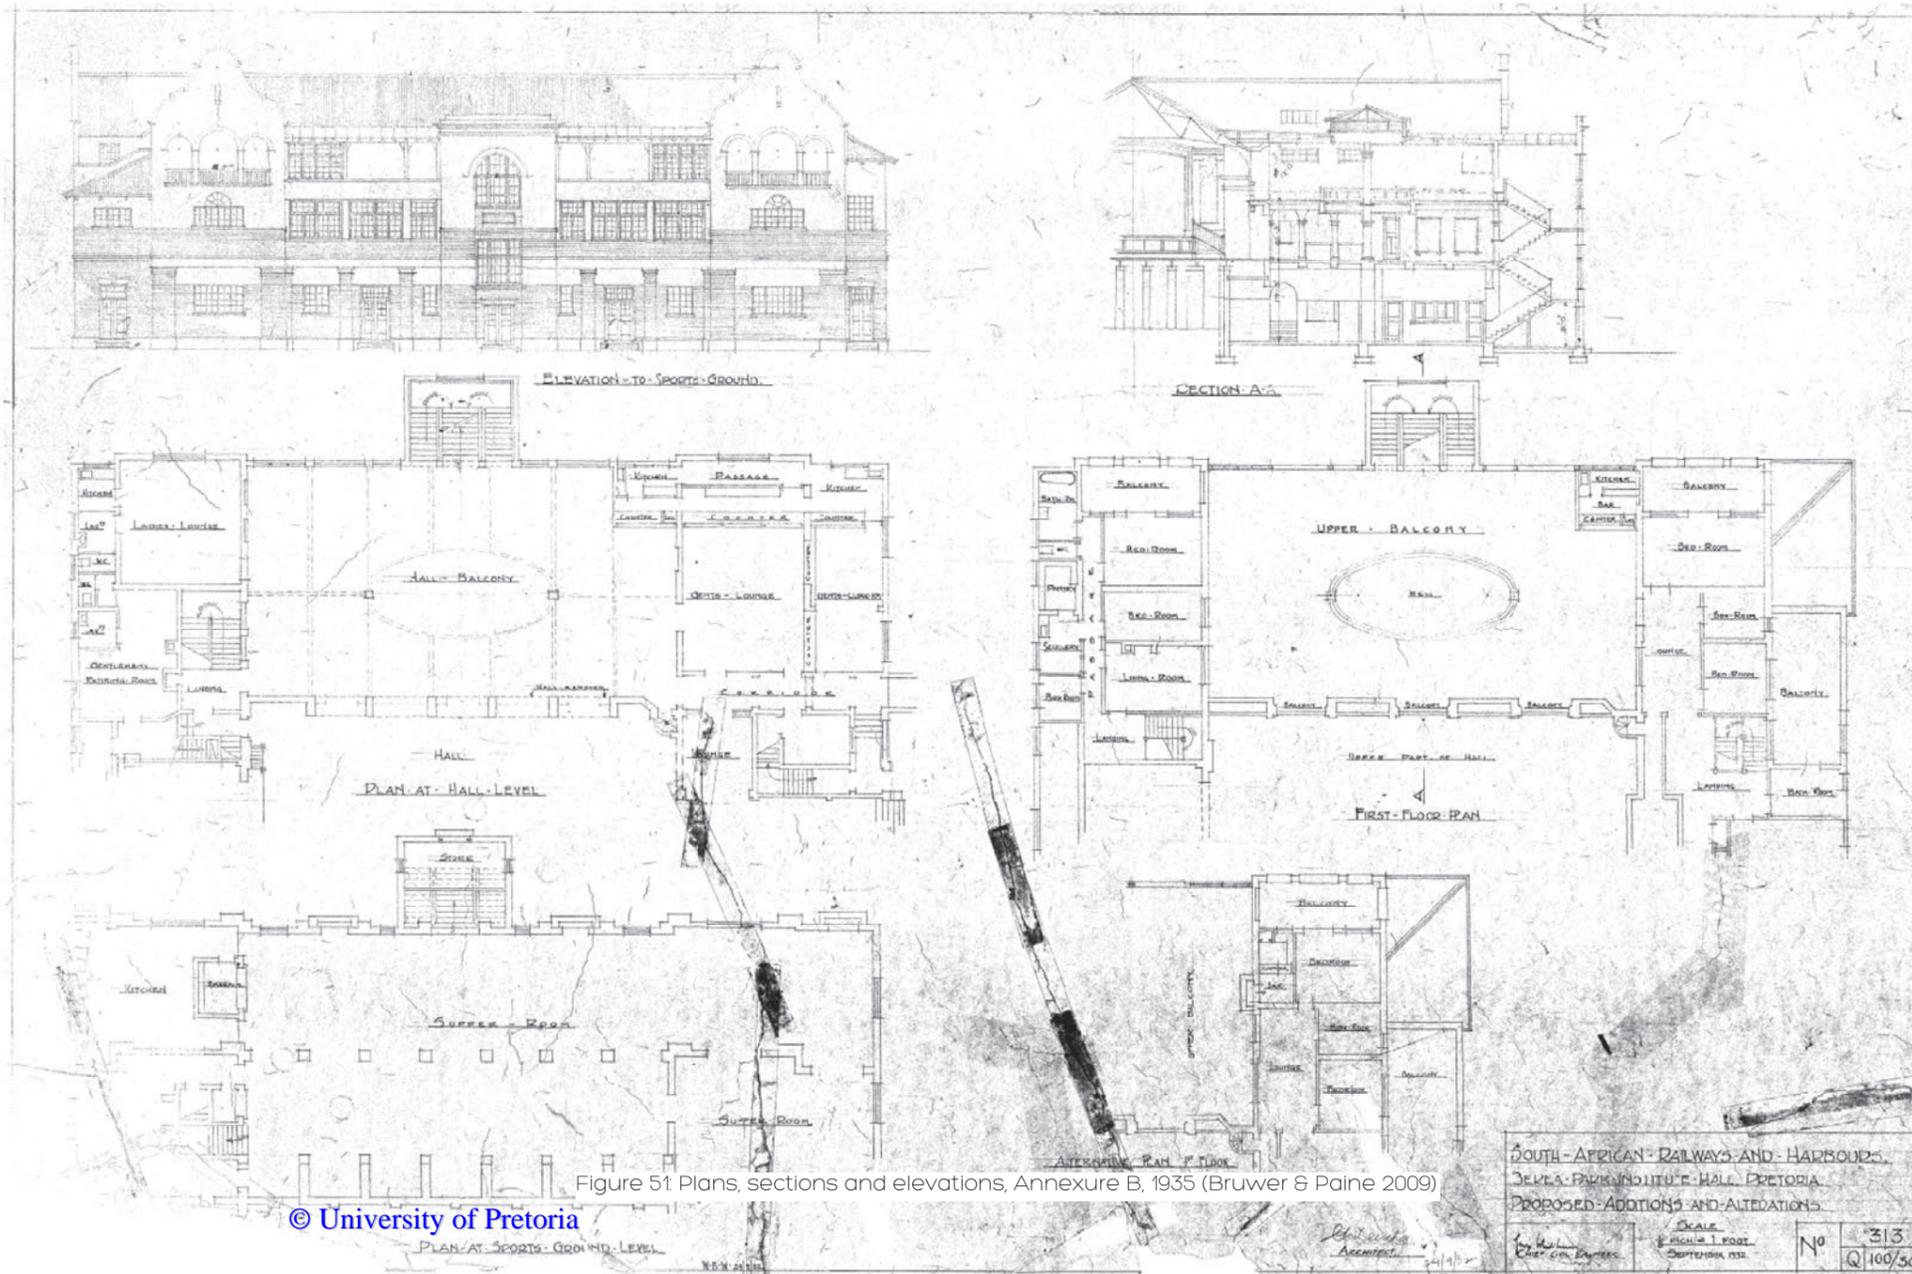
Plans, sections and elevations, Annexure B, 1935 (Bruwer & Paine 2009)
